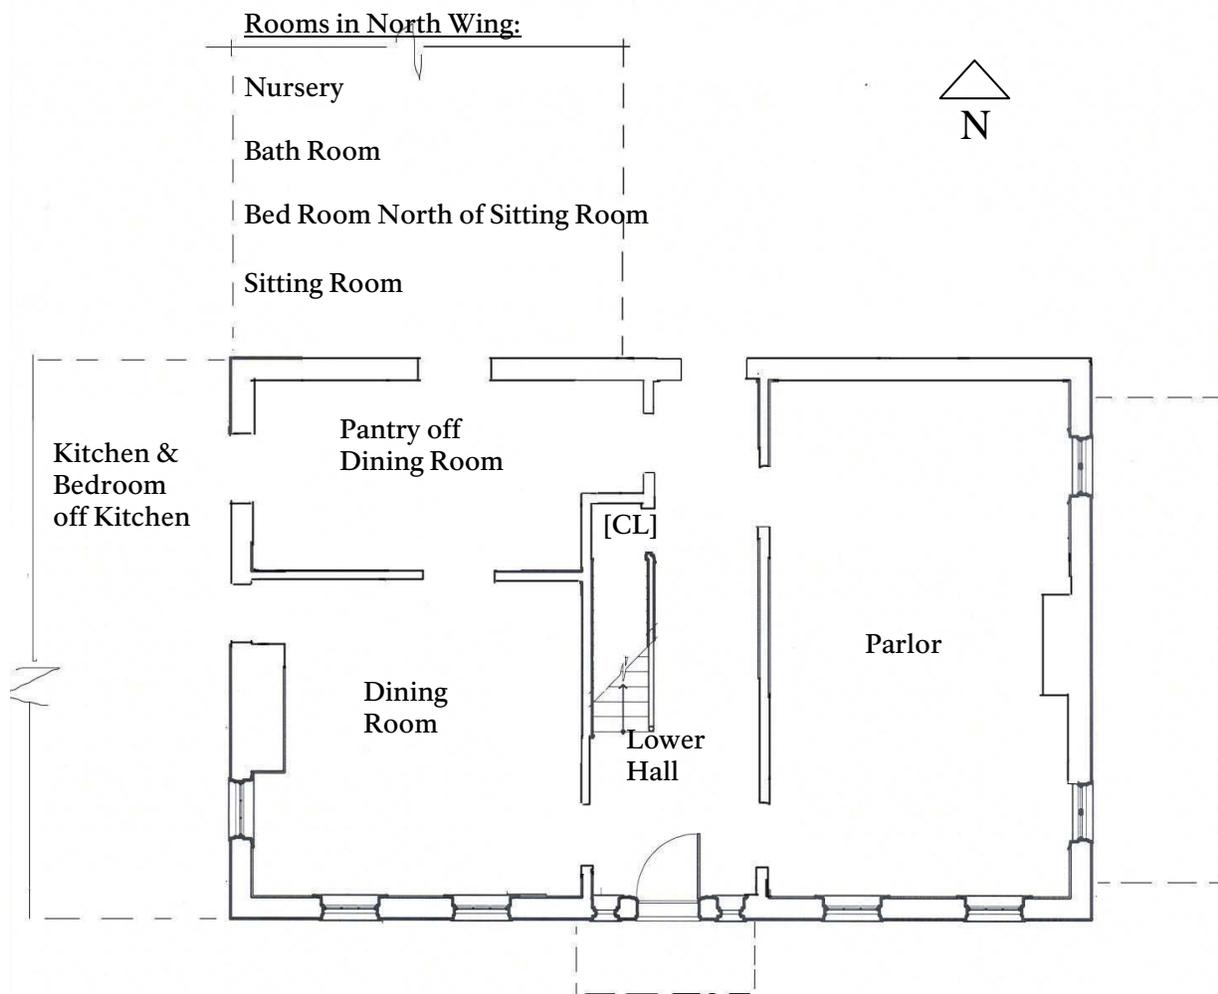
Conjectural first floor plan of the Hunt House, 1889. Room names are from the 1890 probate inventory of Jane Hunt. Not to scale.
